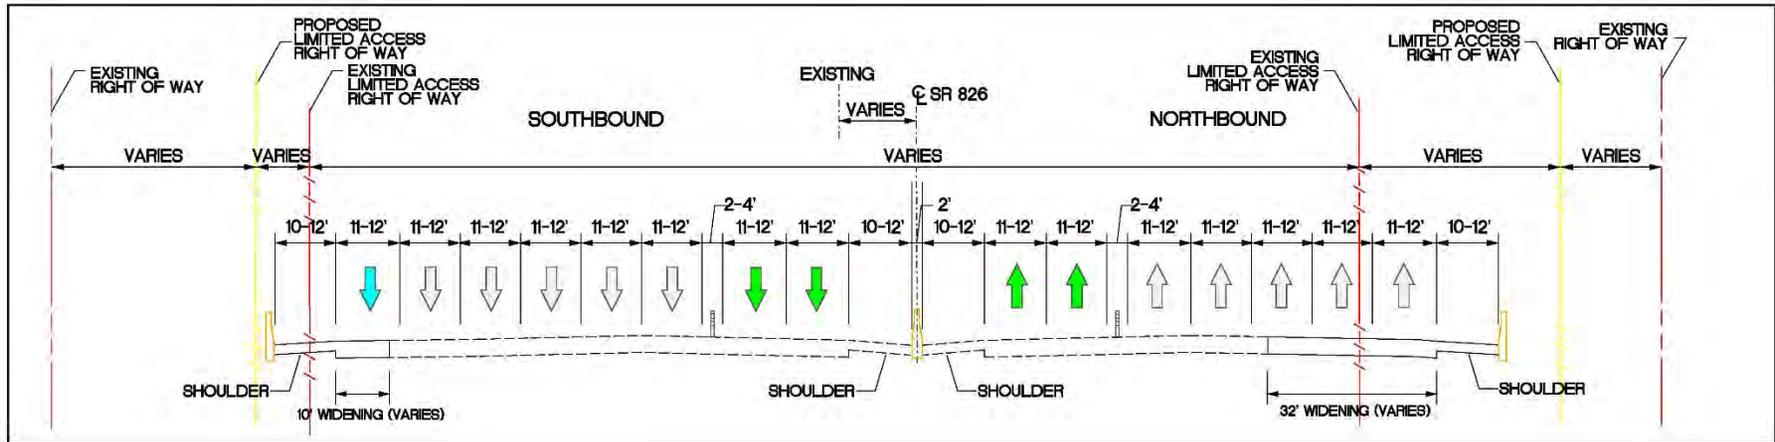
Preferred Alternative Roadway Typical Section between SR 874 and SR 836
